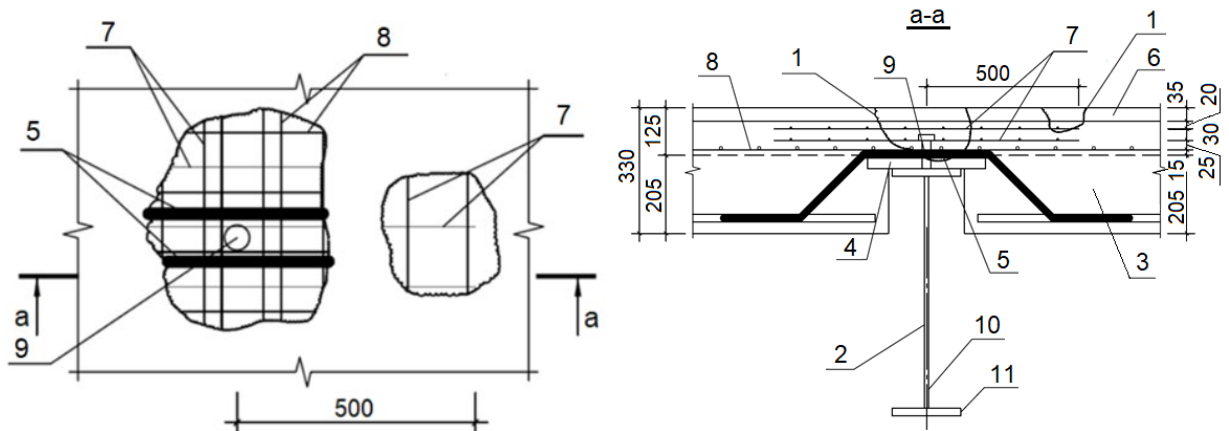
Section of the opening of the protective layer in the section above the steel beam: (1) opening area, (2) welded *I*-beam $h = 650$ mm, (3) monolithic reinforced concrete ribbed plate along the profiled deck, (4) steel support element, (5) bent reinforcing bars $2\phi 14$ A500S, (6) cement-sand screed, (7) reinforcing mesh 4B500-100, (8) reinforcing mesh 8A500S-100, (9) stud connector $\phi 22$, (10) *I*-beam web 12×600 mm, (11) bottom flange *I*-beam 25×180 mm.
